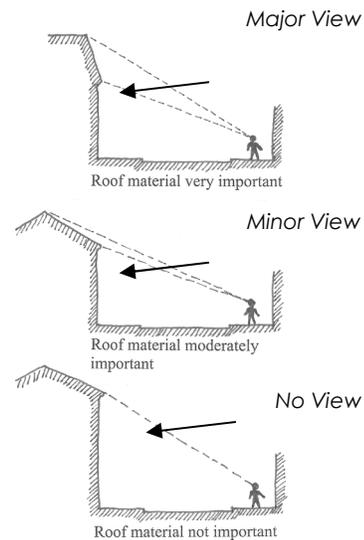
The prominence of a roof and the height and angle of the roof when seen by a pedestrian or from a passing automobile will be factors that New Hope HARB considers in its evaluation of each roof-replacement proposal.
